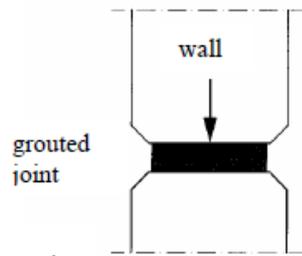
Grouted connection (Du Béton & Engström, 2008)
